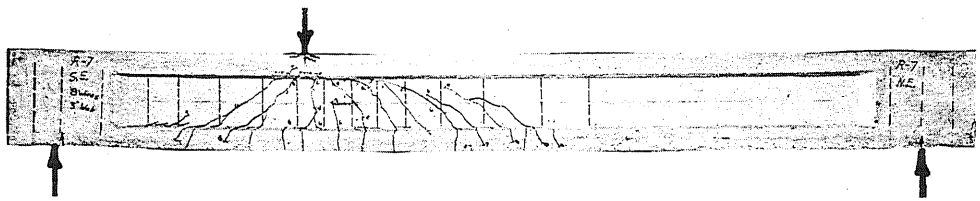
CRACKING, OR "SPLITTING", ALONG THE REINFORCEMENT
